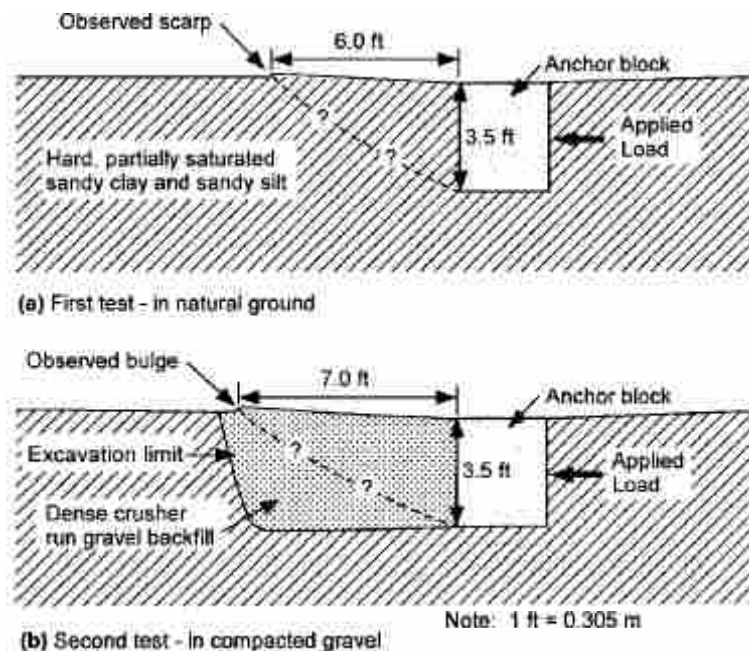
Soil failure type during testing various backfill conditions (Duncan and Mokwa 2001)
